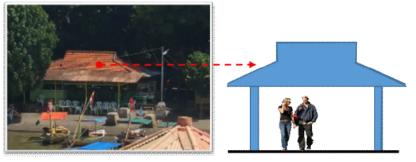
Existing Arrangement of THP Kenjeran Buildings and Facilities
